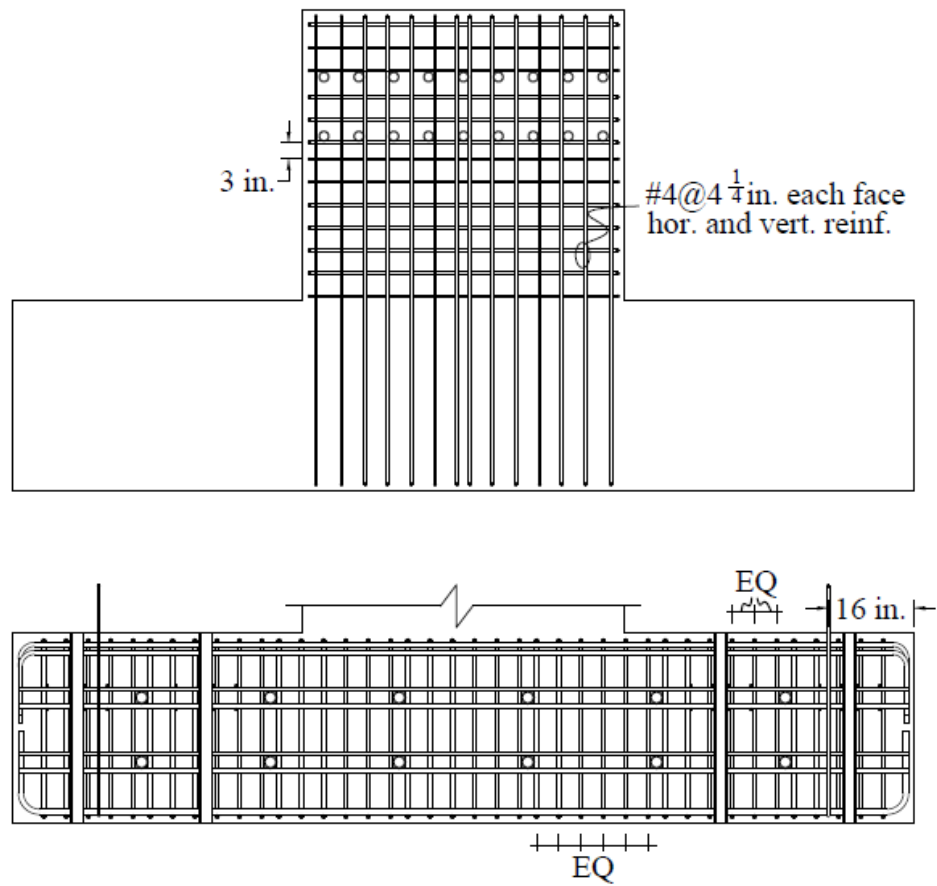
Reinforcement details for a wing foundation beam (Note: 1 in. = 25.4 mm)
